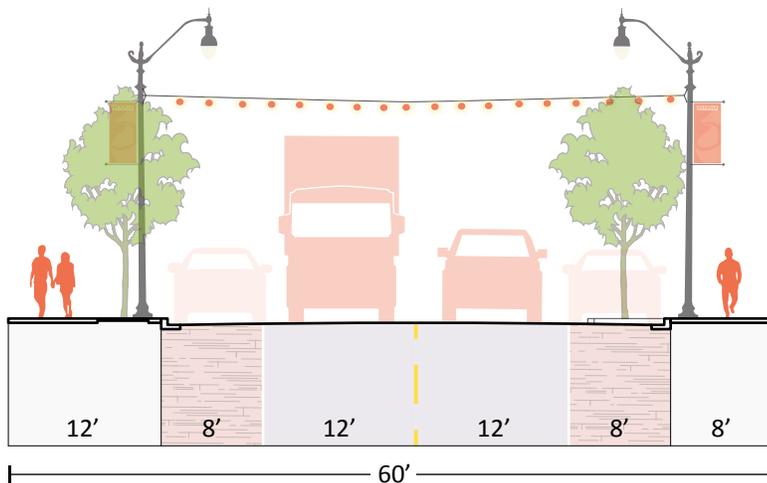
C (1). Van Emmon Street (Long-term).
